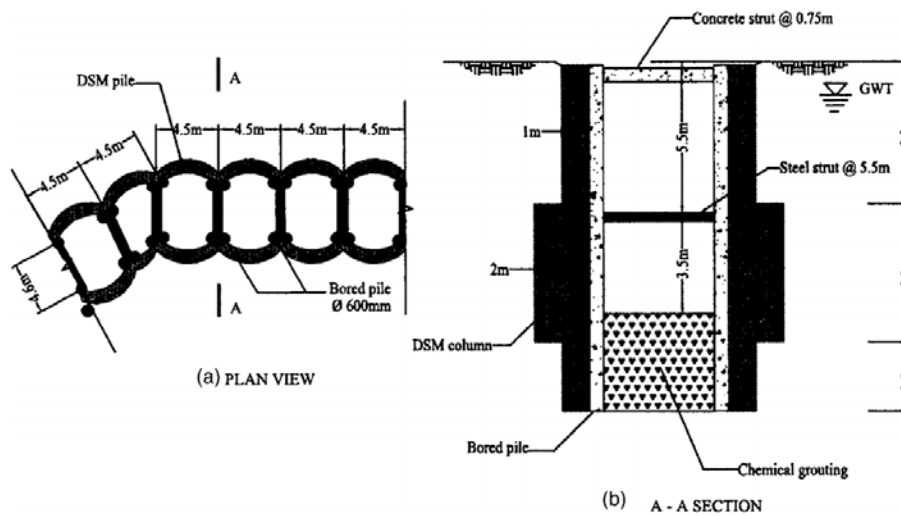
Plan view and cross section of the excavation (after Shao et al., 2005).
